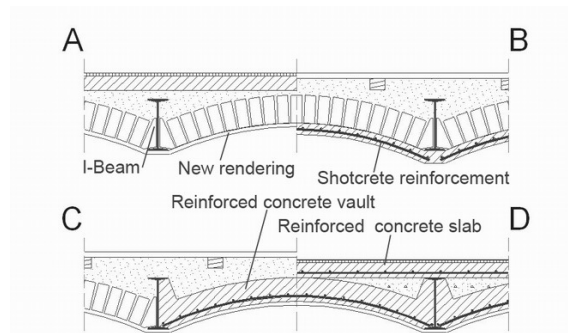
Repairing methods of brick vaults between I-beams (jack arches):
